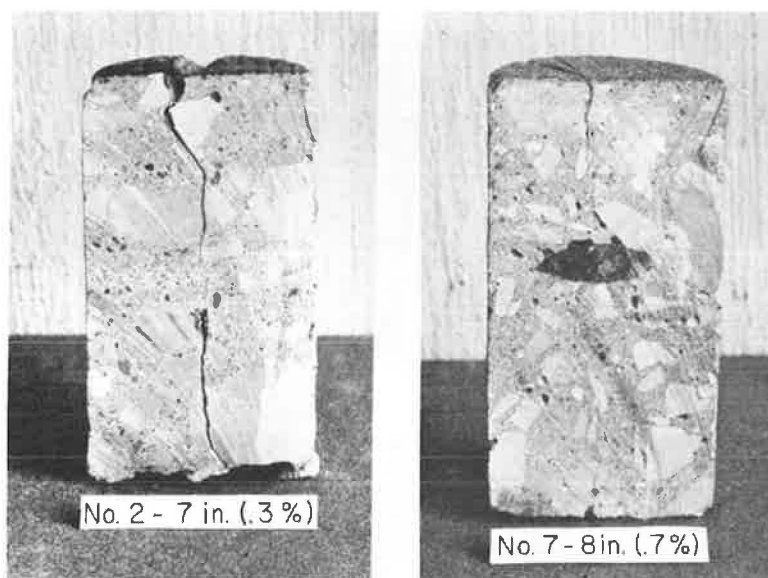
Condition of transverse cracks as seen in cores sawed to expose clean face of concrete.
